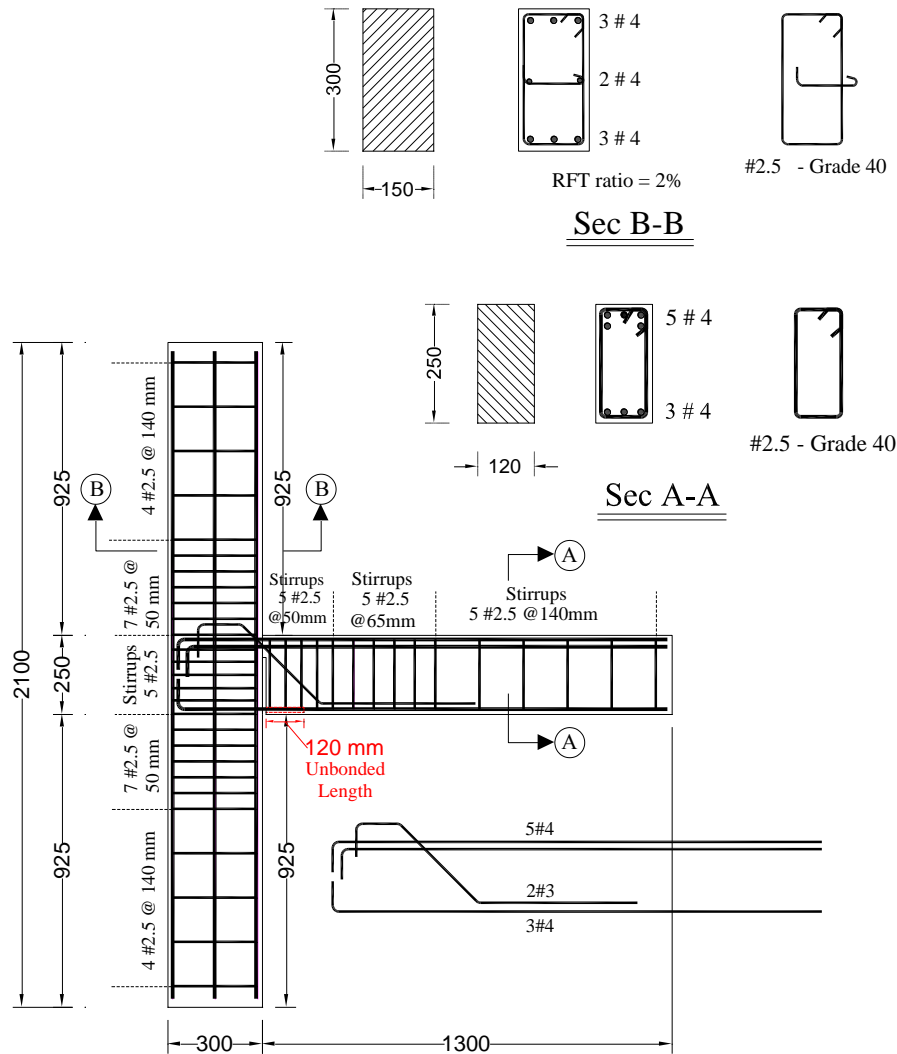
Details of Slotted Beam-Column connection with 120mm unbonded length SL-120
